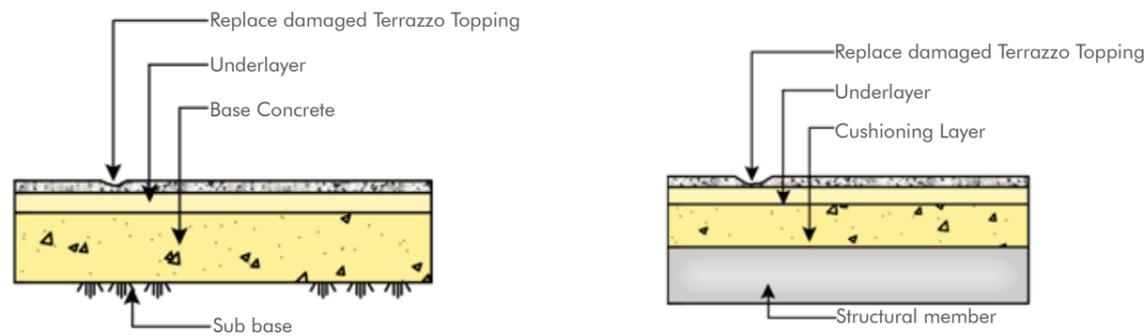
Detail of terrazzo flooring, Source: IS: 2114- 2018
